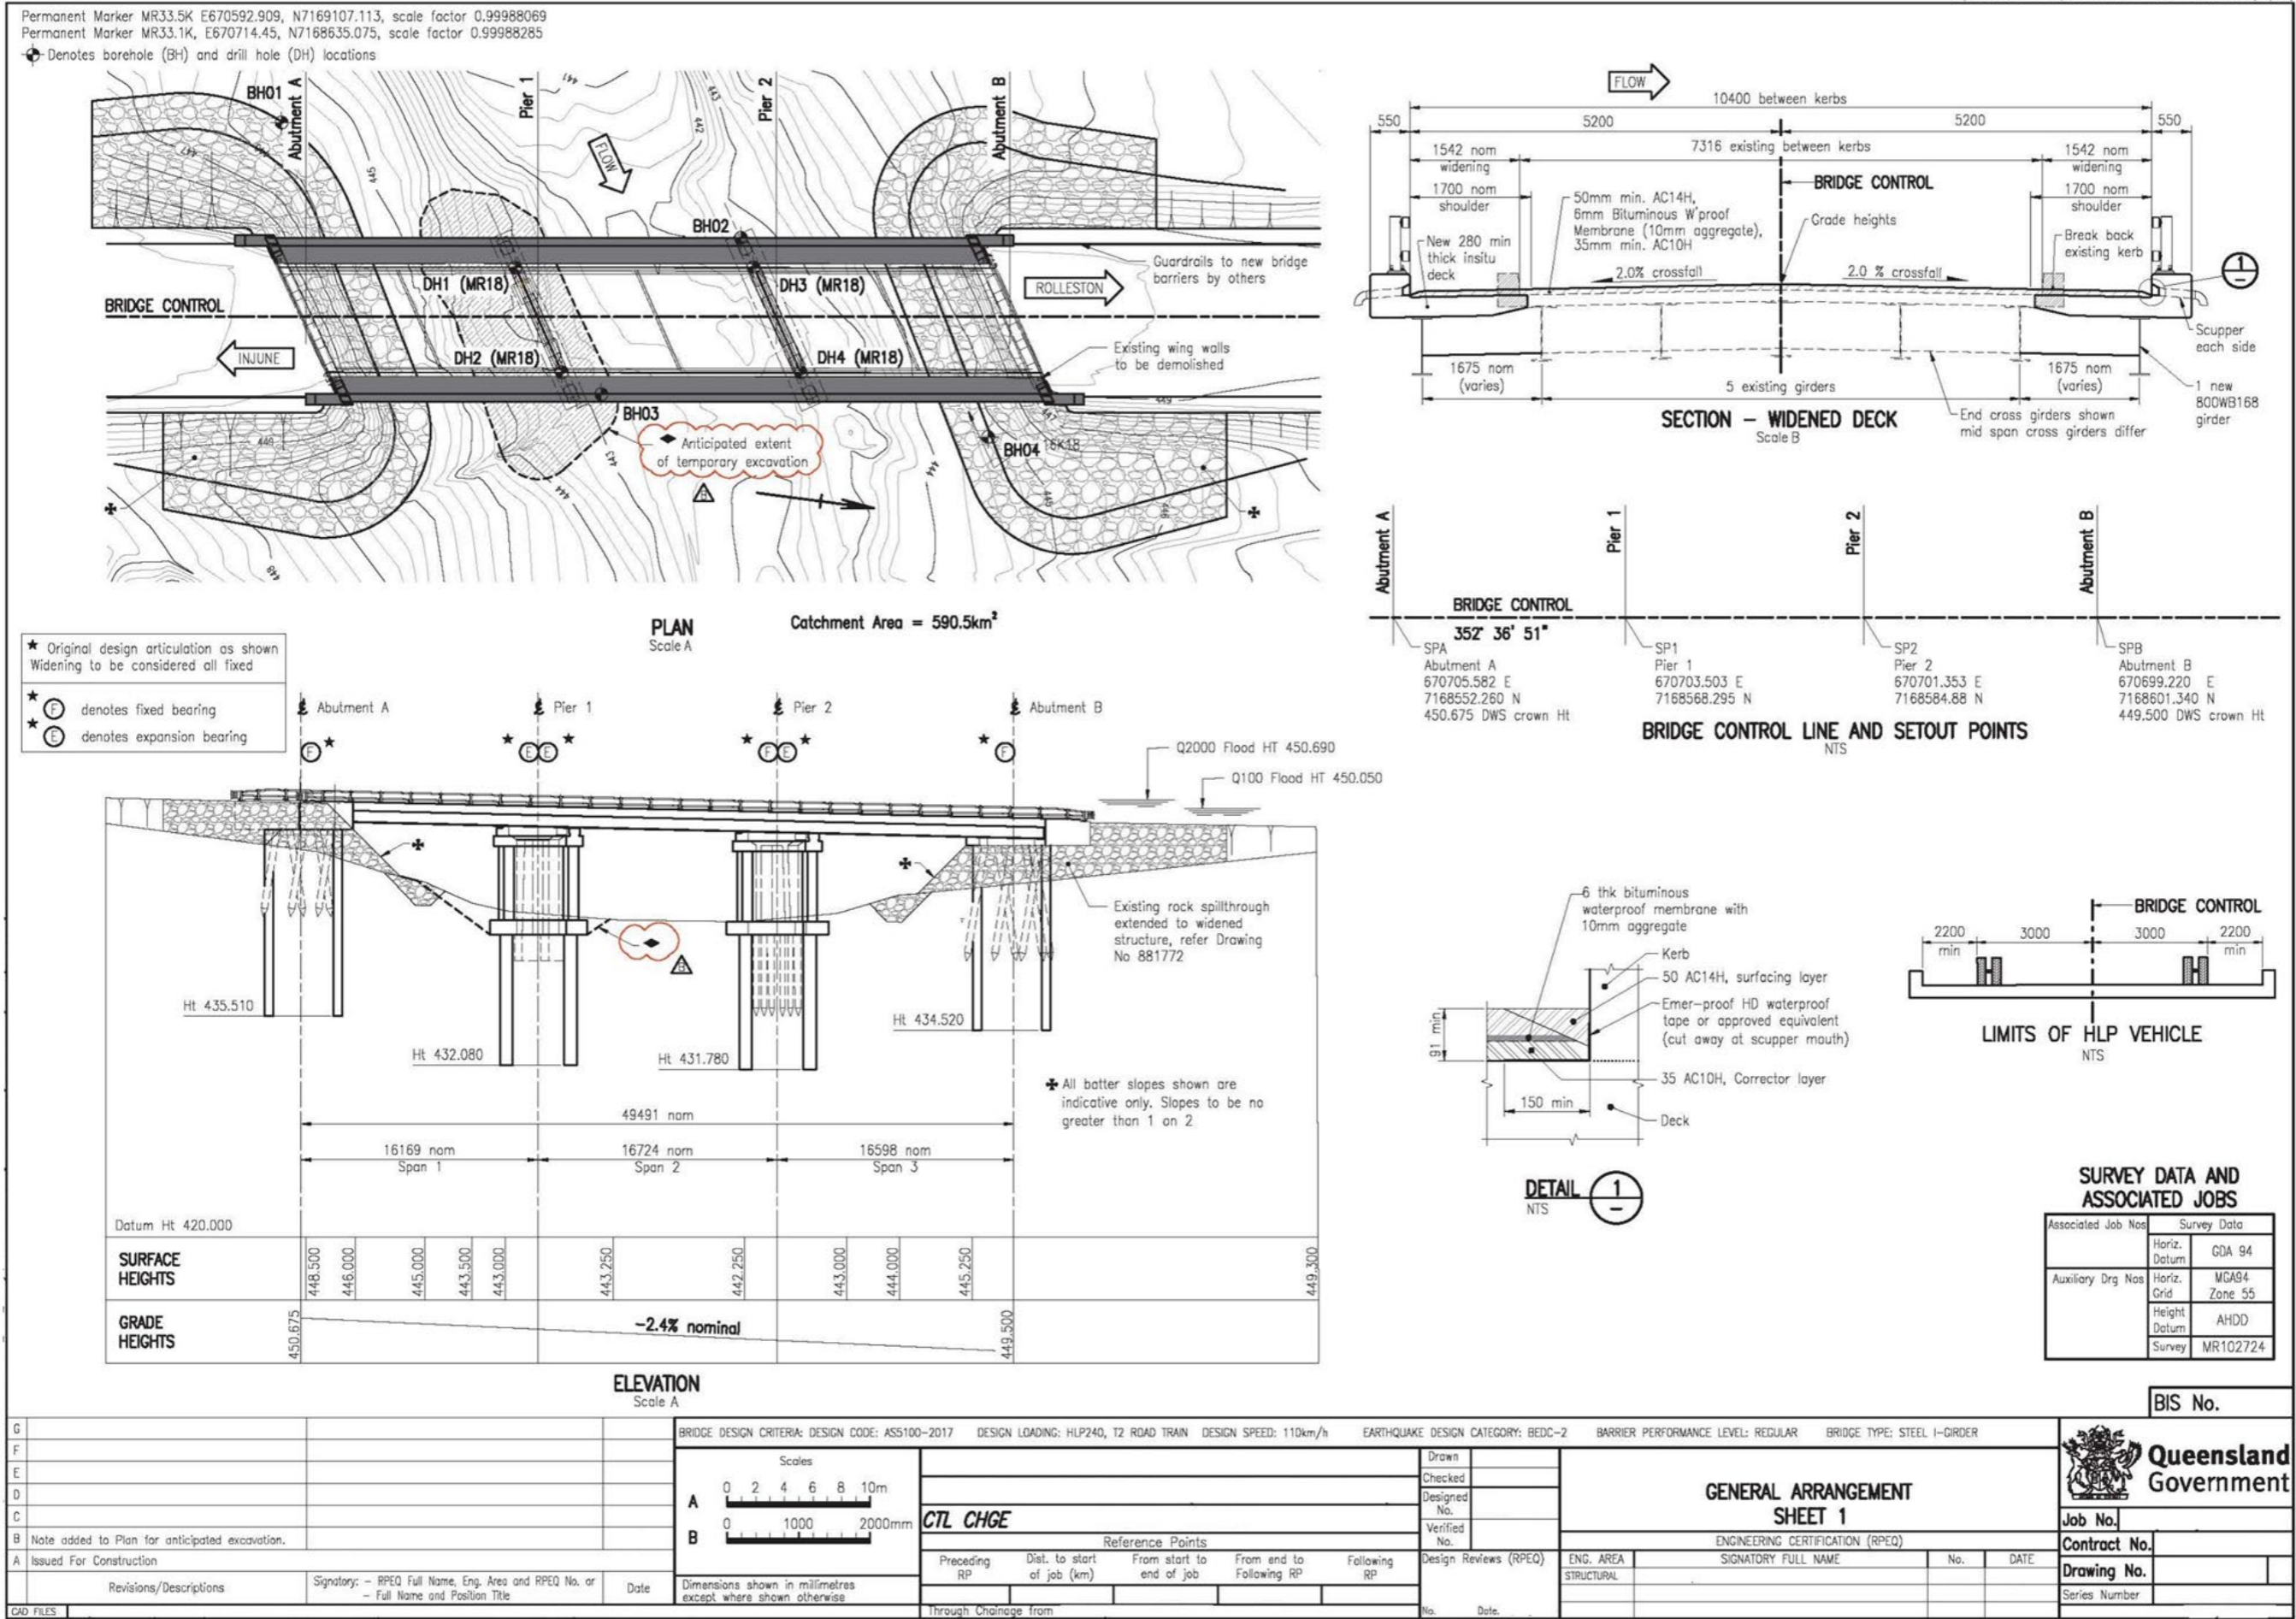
(k) - Steel I-beam drawings - widening of existing bridge - General Arrangement - Sheet 3
